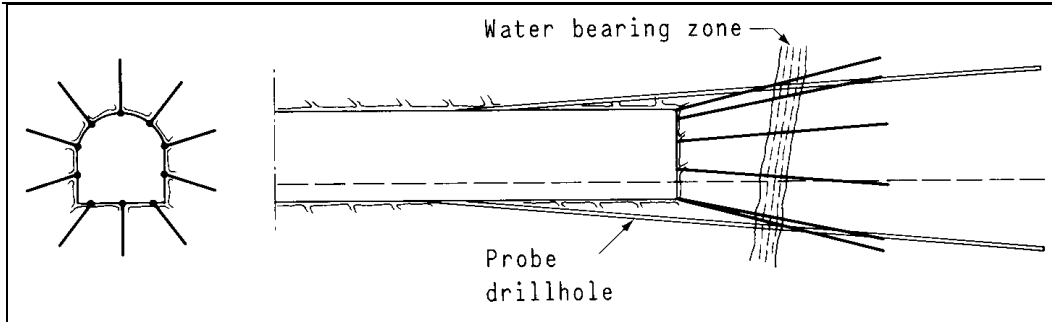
Principle of pre-grouting in a water-bearing zone
